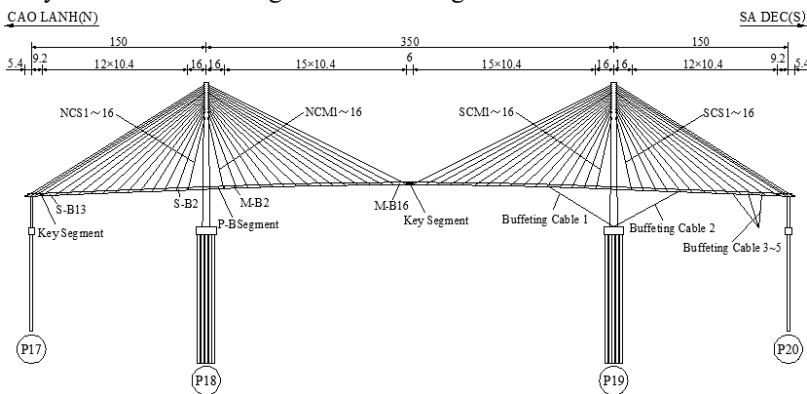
General layout of main bridge of Cao Lanh Cable-Stayed Bridge(Unit: m)
